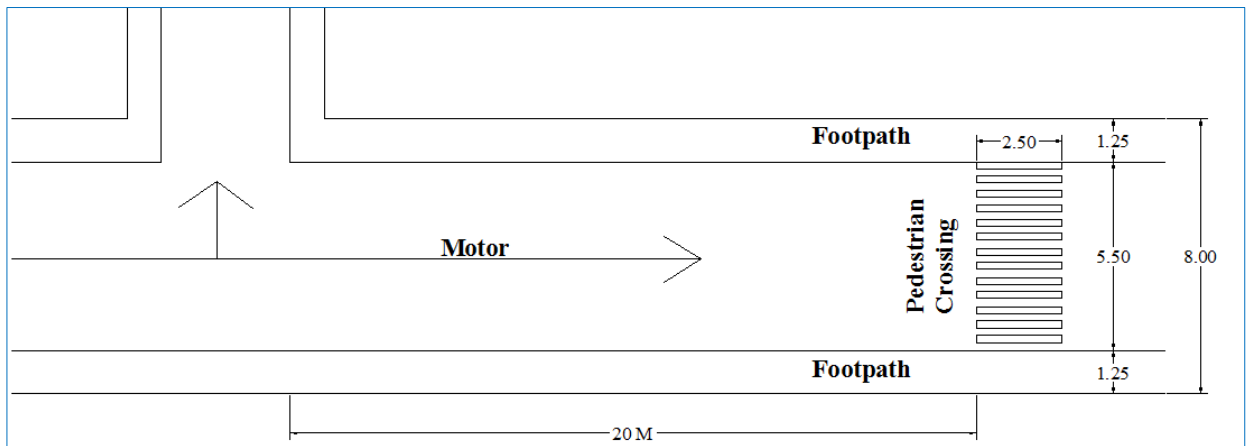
Typical Plan of Pedestrian Crossing, C. Class Road
